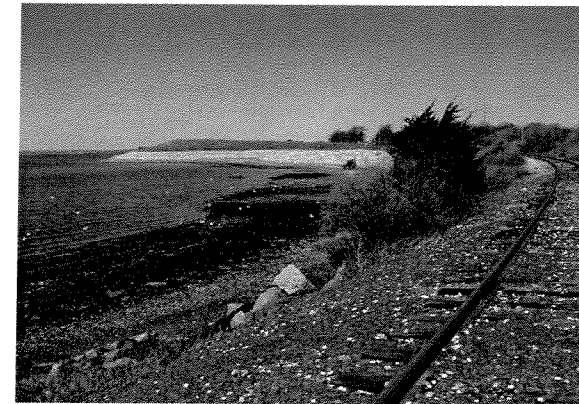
Newly capped McAllister Landfill with new rip-rap (white strip) located adjacent to the Subject Property.
